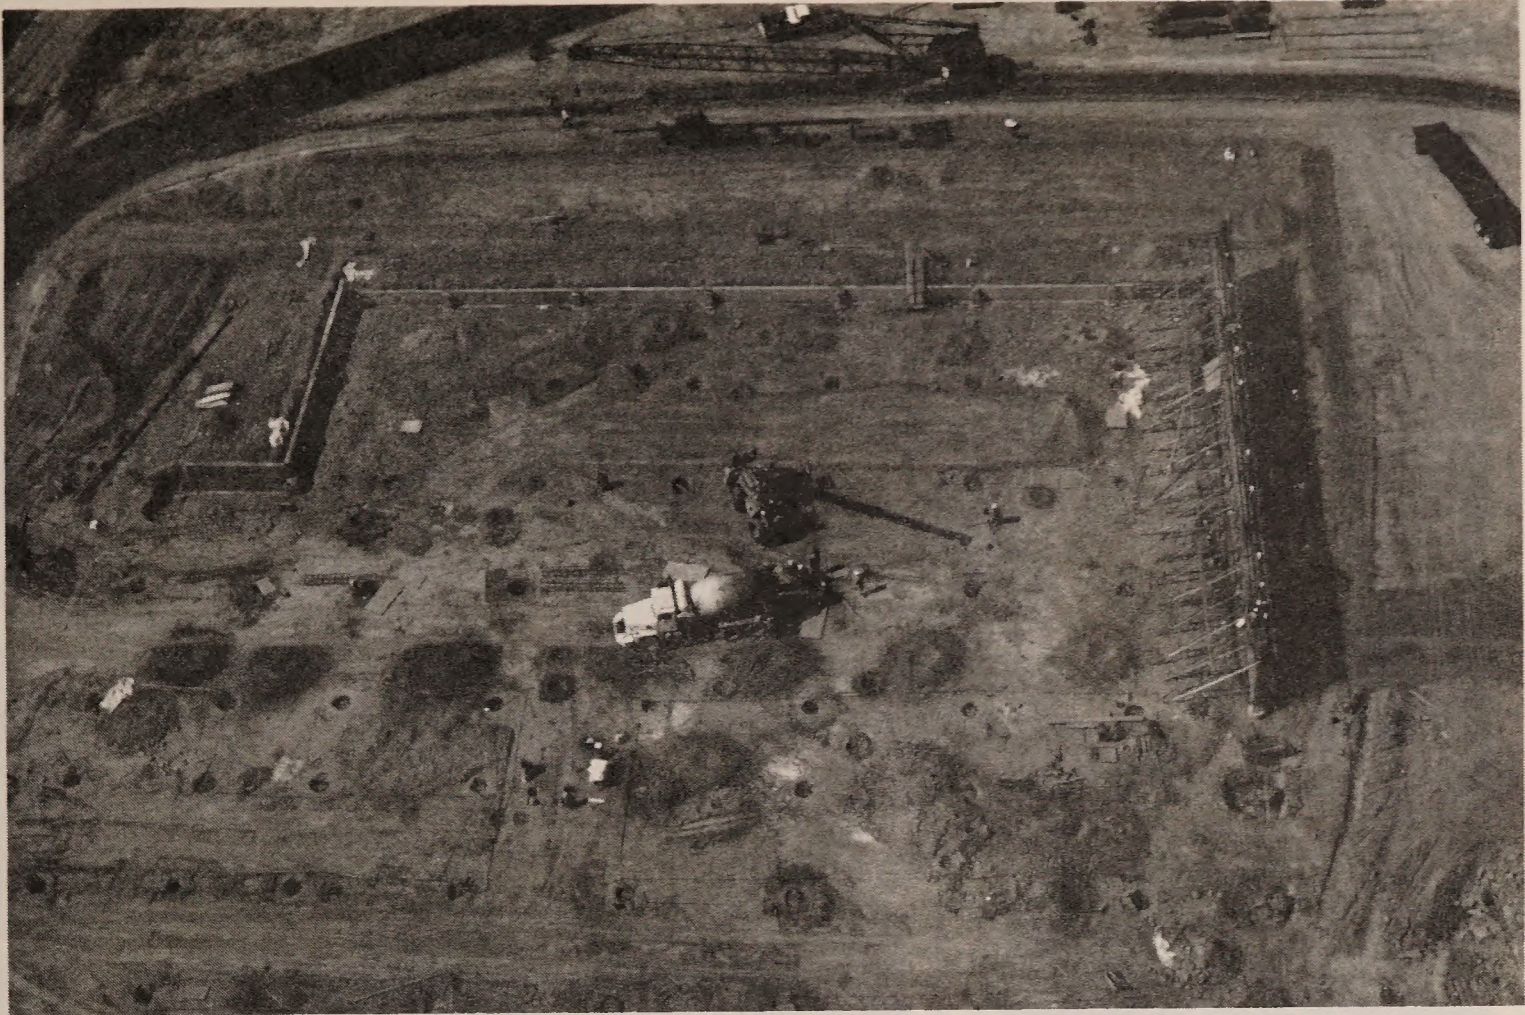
Pouring footings for the changehouse/operations building. (September 1981)
